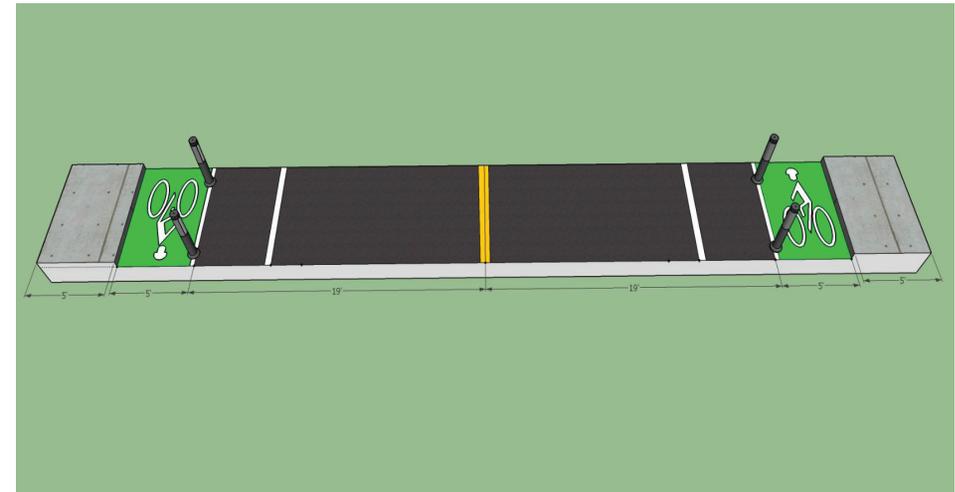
Current design of Maynard Terrace bridge over I-20 between East Atlanta and Kirkwood, looking northeast
